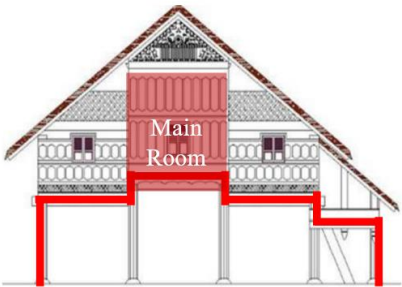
Levels of elevations in *Rumah Aceh* (Source: <https://gln.kemdikbud.go.id/>, accessed on 2023)
